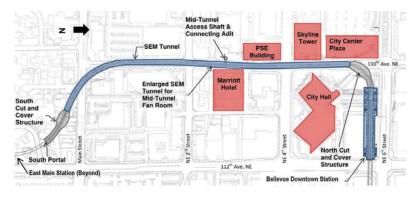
Location of Downtown Bellevue Tunnel (from Wongkaew et al. 2018).
